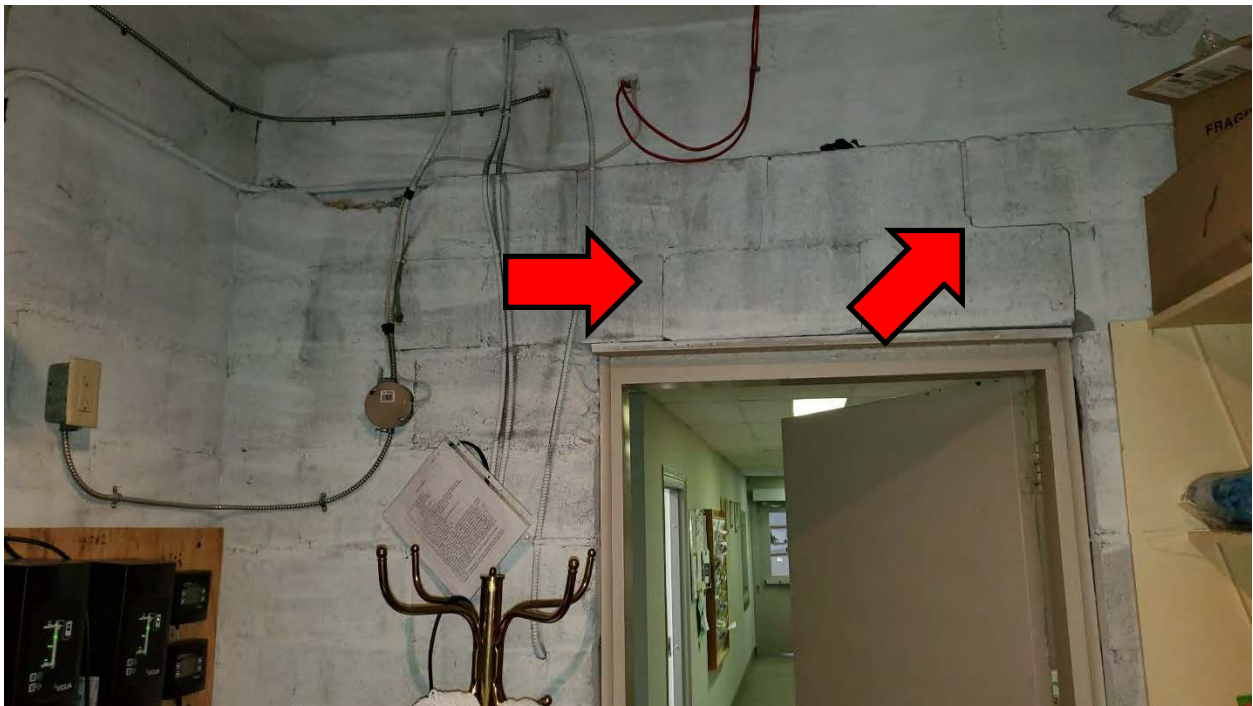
Municipal Office: Cracks in masonry over Mechanical Room door.
